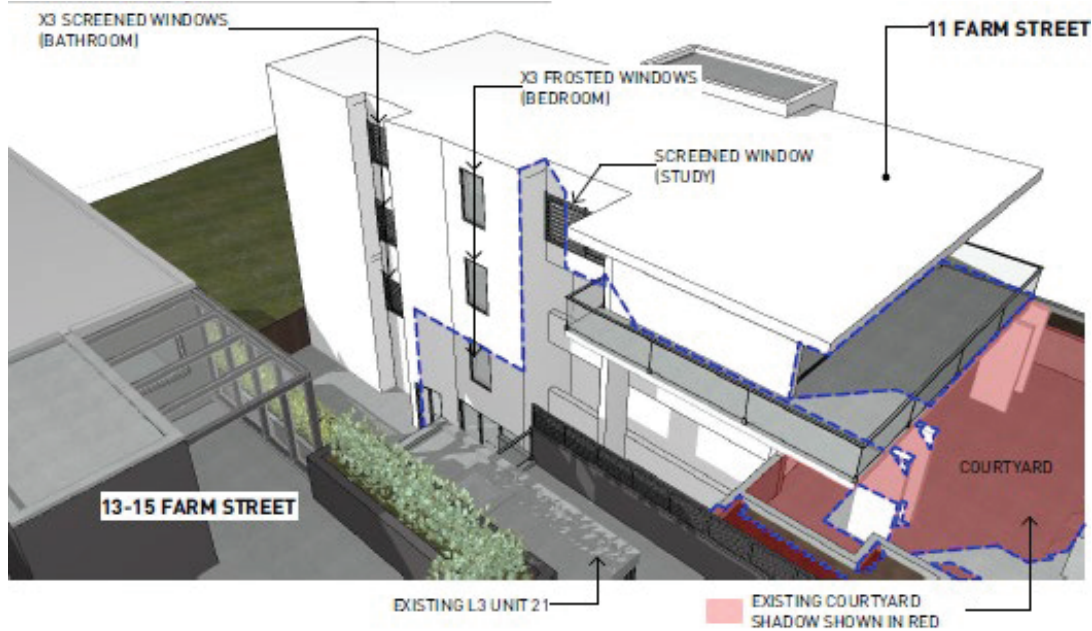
Western elevation of 11 Farm Street, facing the subject site.
